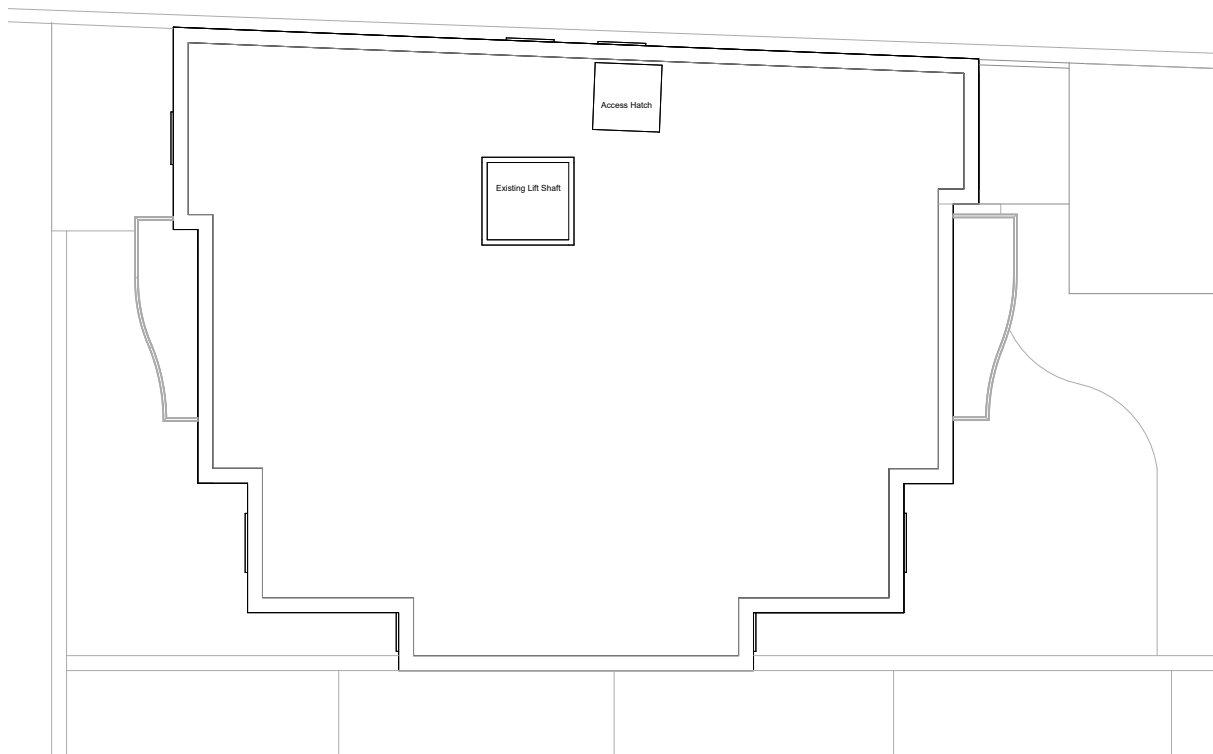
BLOCK 3 APPROVED ROOF PLAN
